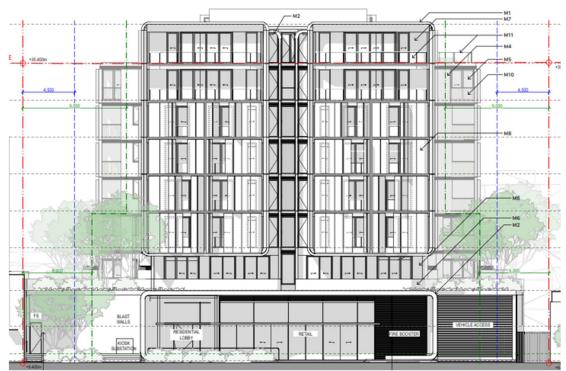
Northern (Gardeners Road) elevation (supplied by the applicant)
